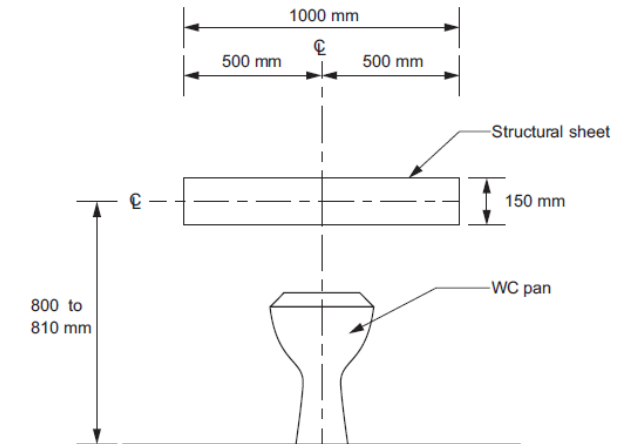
Location of sheeting for a wall behind a toilet pan
